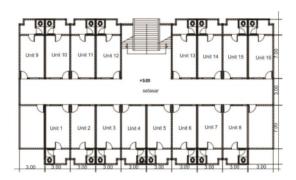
Floor plans 2,3,4 Wonorejo Flats
